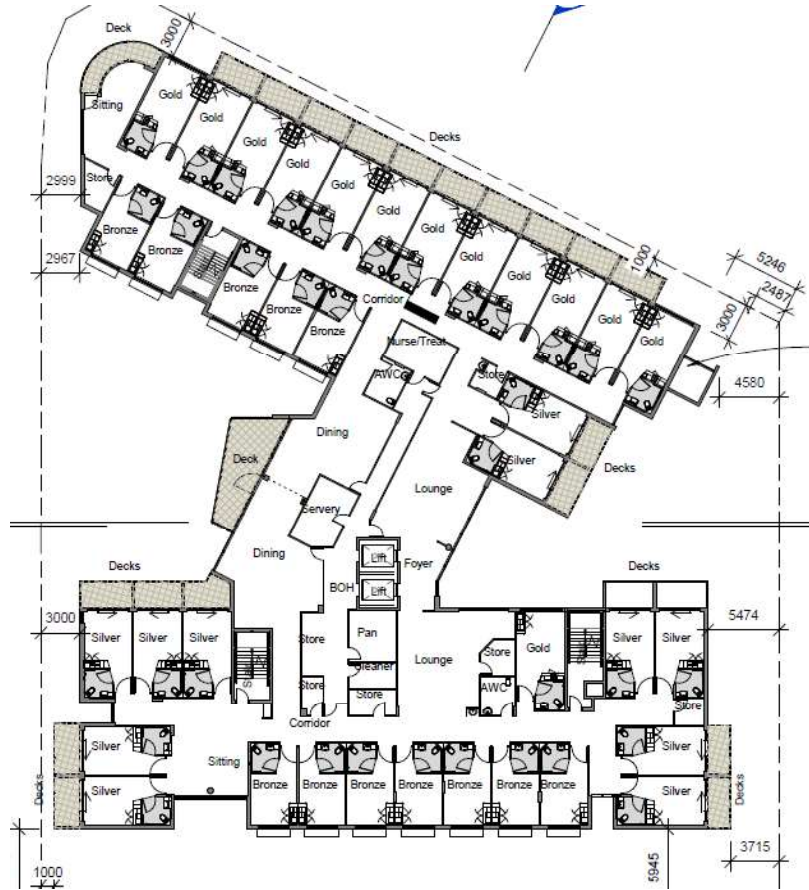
Proposed Typical Residential Floor Plan (Source: GJG Architects)
